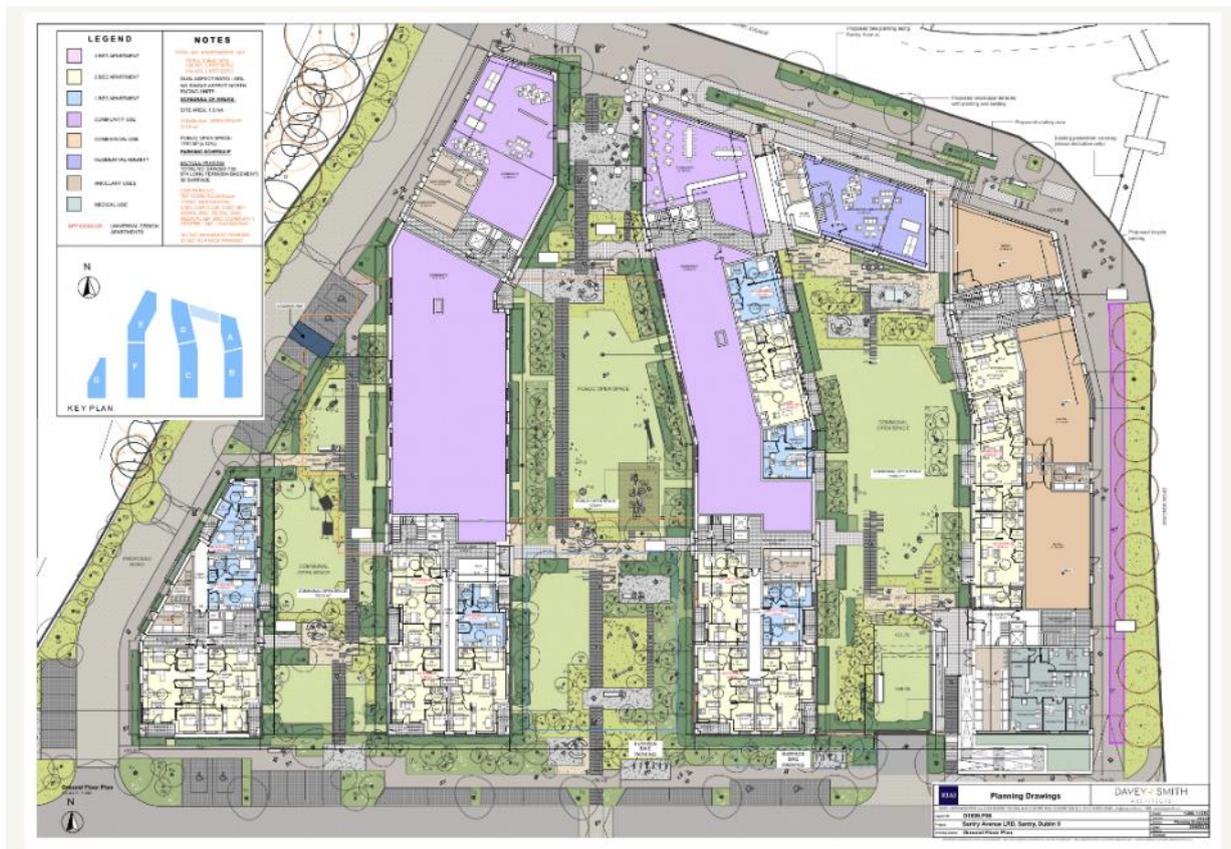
Site Layout (Source: Davey Smith Architects, Drg No. D1809.P06)
